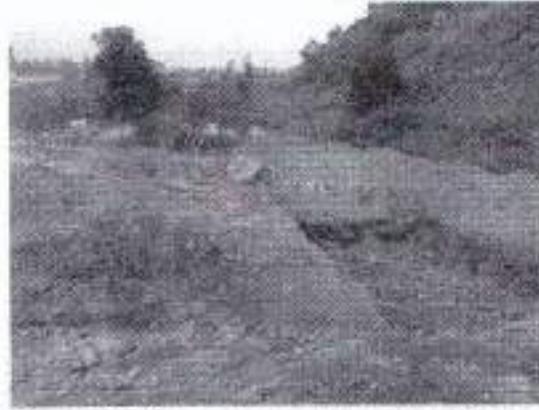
Photo of catch drain and siltation pond around one side of Honhe OB dump.
